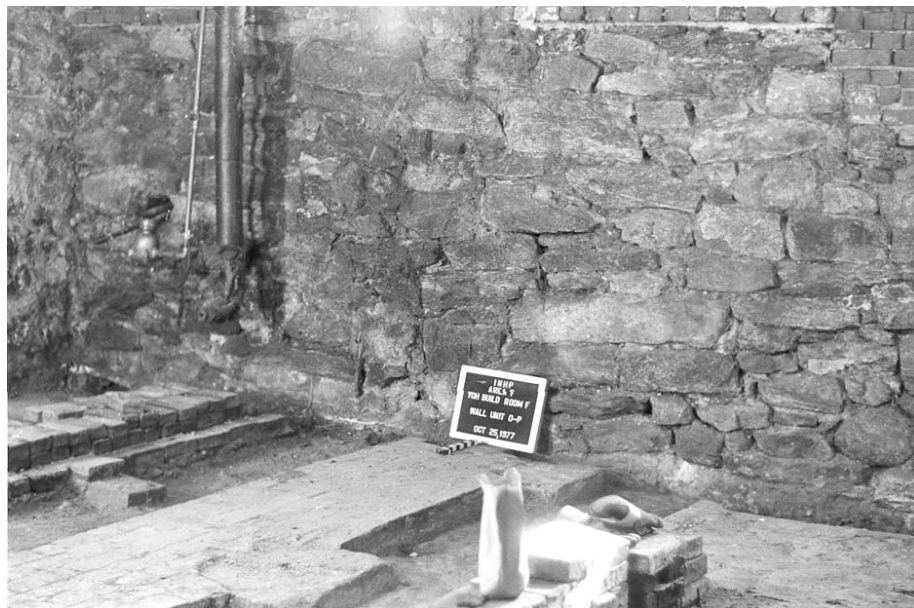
Area F, Yoh Building, Room F, brick floor in process of being removed; wall unit O-P, view southeast. Note base of bricked-in window opening at top of photograph. Wall O-P is in the approximate location of the former 1-3 Gray's Alley.
